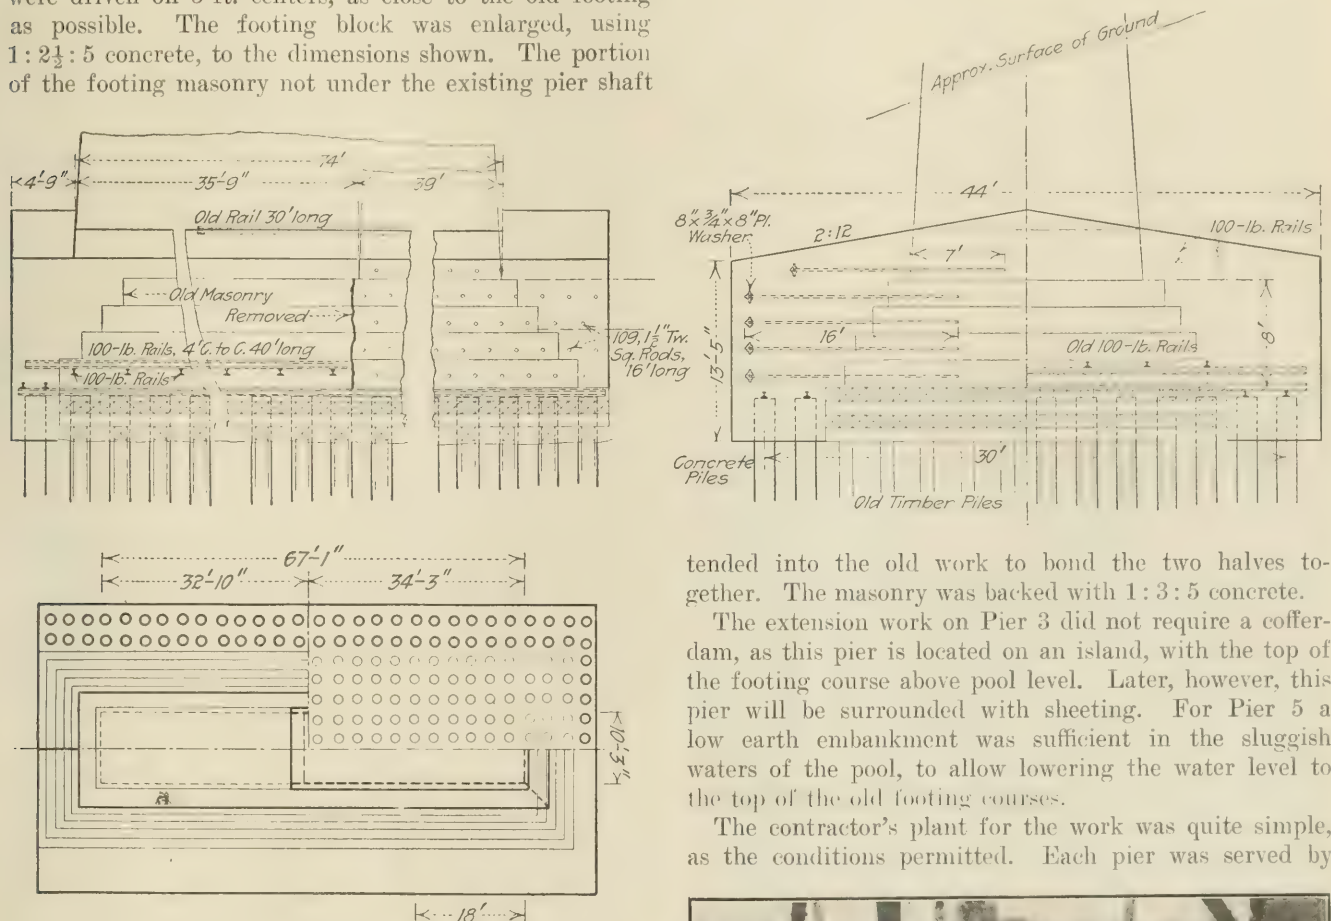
FOUNDATION REINFORCEMENT, PIER 1
